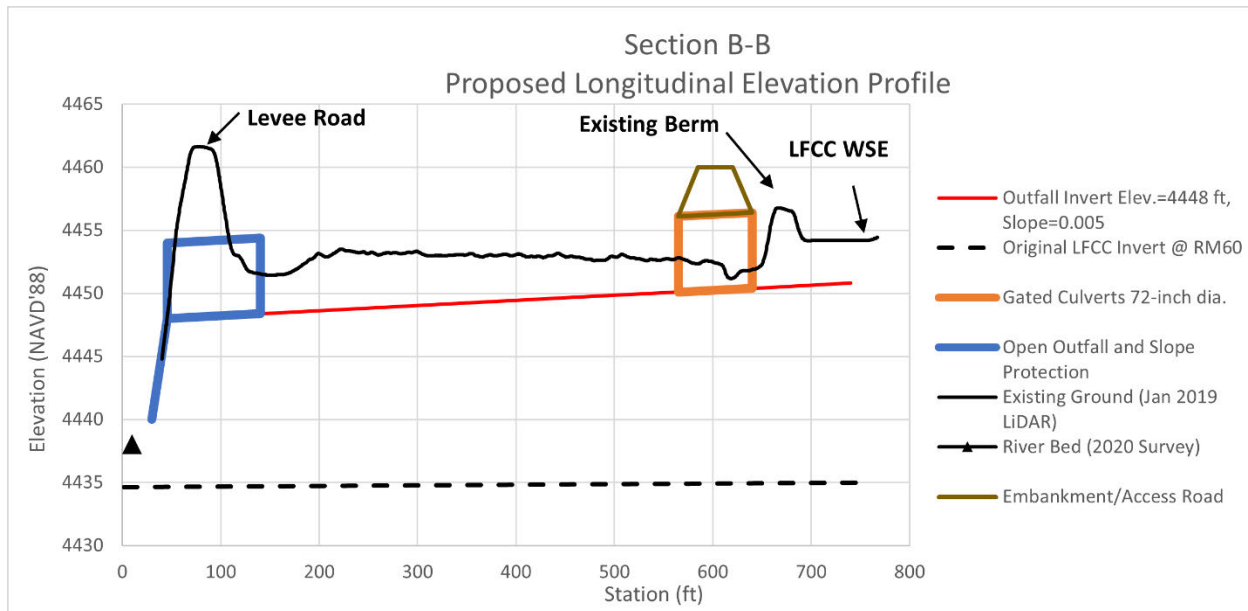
Proposed longitudinal elevation profile and project components along Section B-B (see Figure 7)
